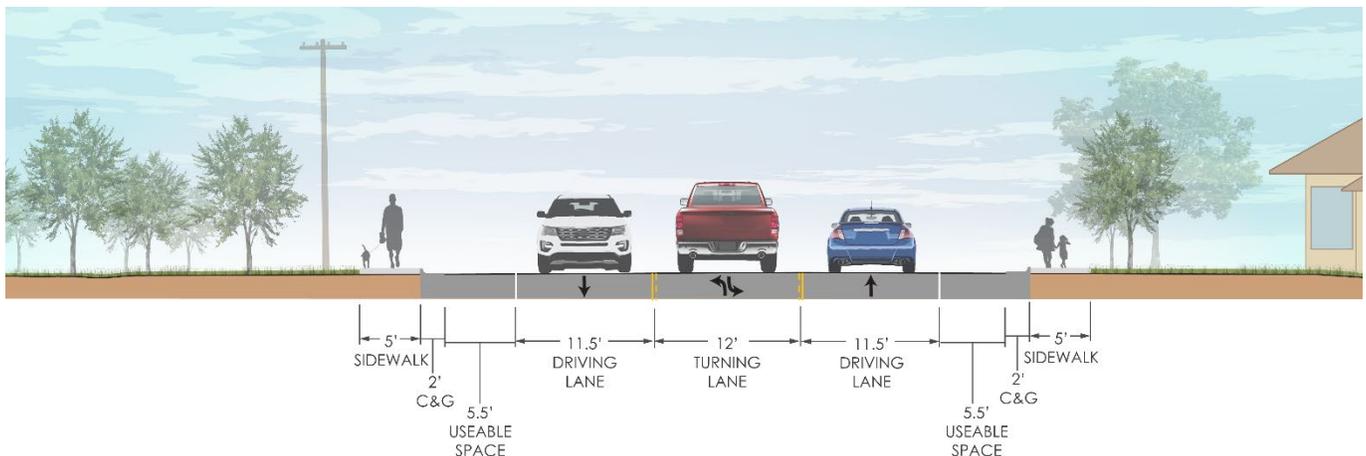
Mary Street Alternative Roadway Typical Section for Road Diet
